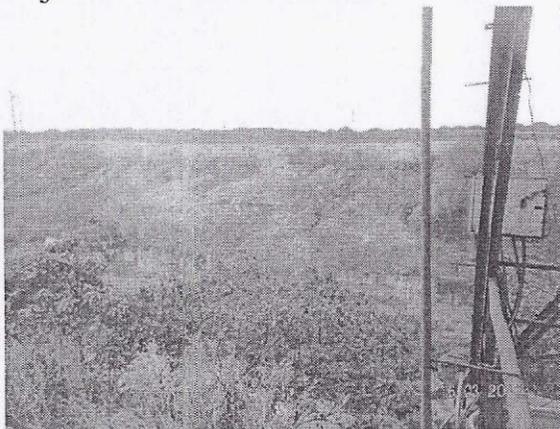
Photo of grassing and vegetation on the slopes between railway siding and river Sonadubi.
